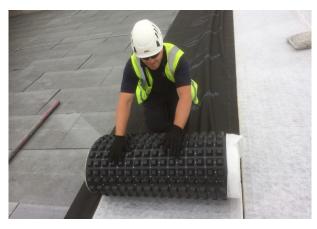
Lay with geotextile filter & cuspate openings facing up.
